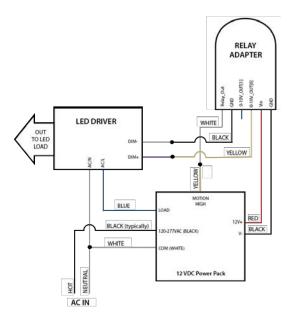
OLD Relay Fixture Adapter for LED Drivers
